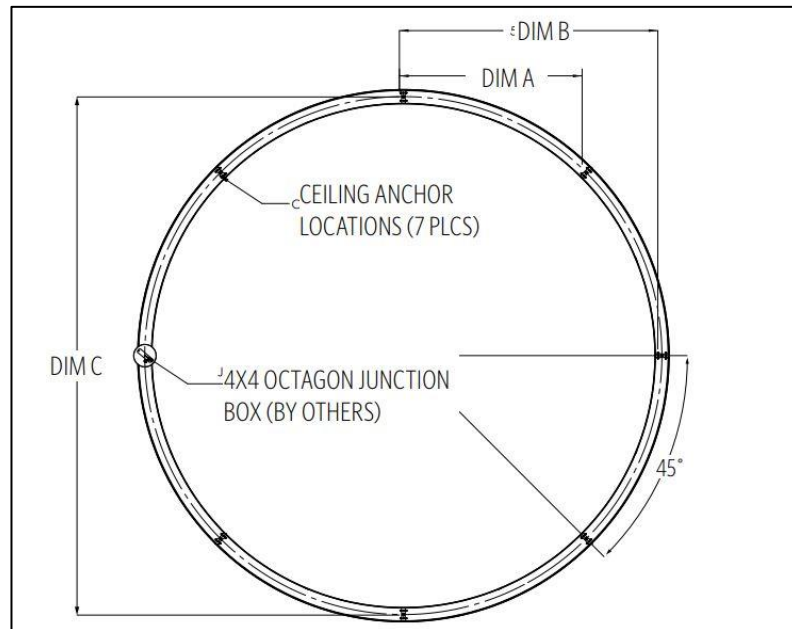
TOP VIEW SHOWING MOUNTING VIEW INFORMATION
